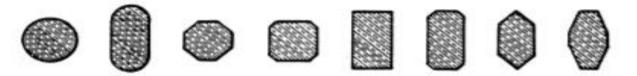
Typical cross-section shapes of piers for overcrossings or viaducts on land.
